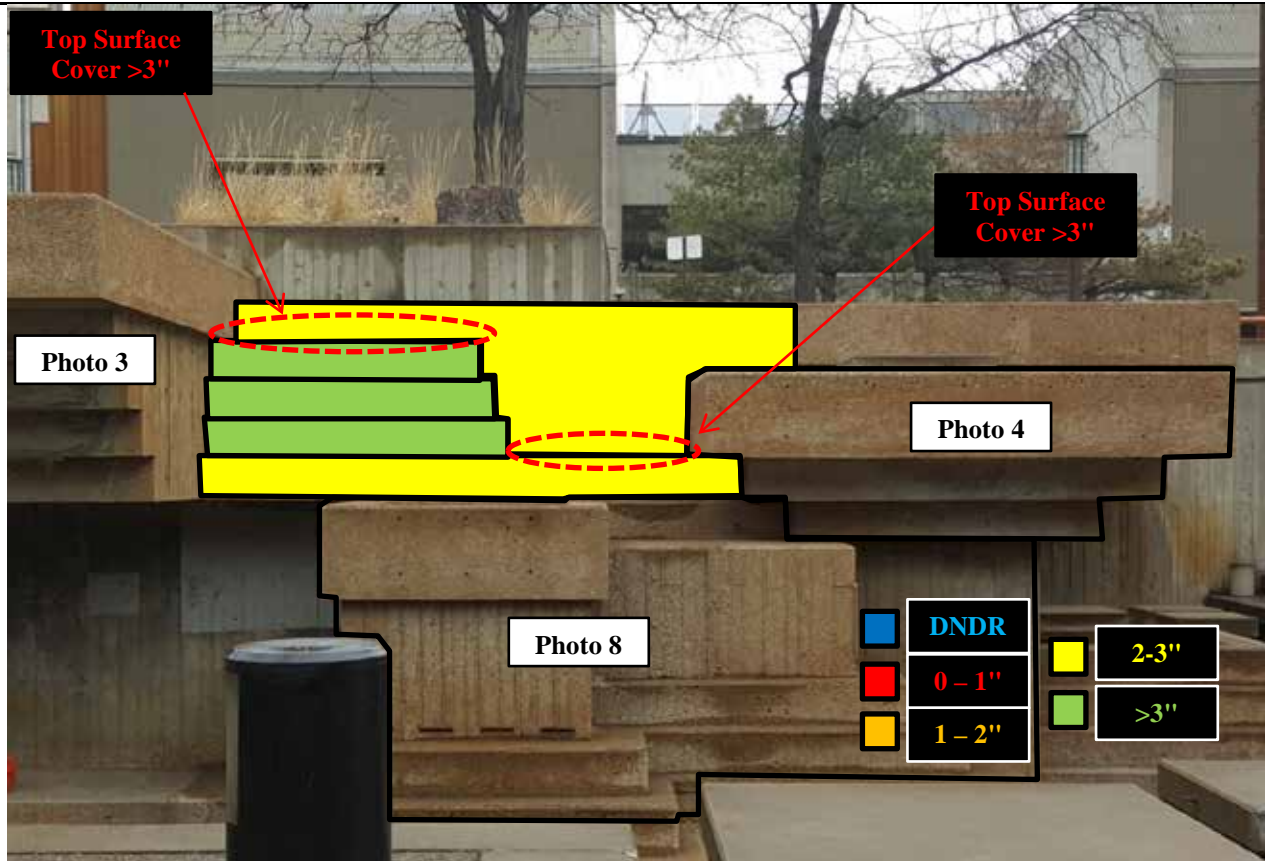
Facing Nicollet Avenue toward the south "fountain steps" near the southeast corner of the fountains.
